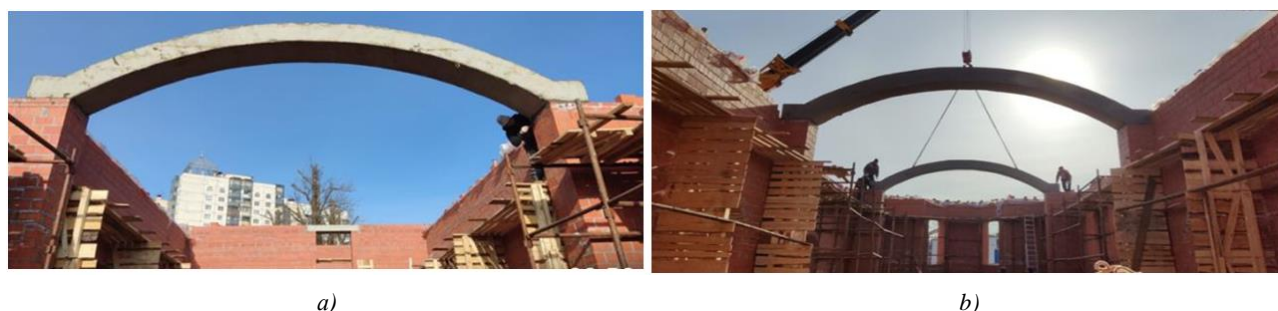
Arched beam installation: a — a beam mounted on a support pilaster; b — crane mounting with a tip
